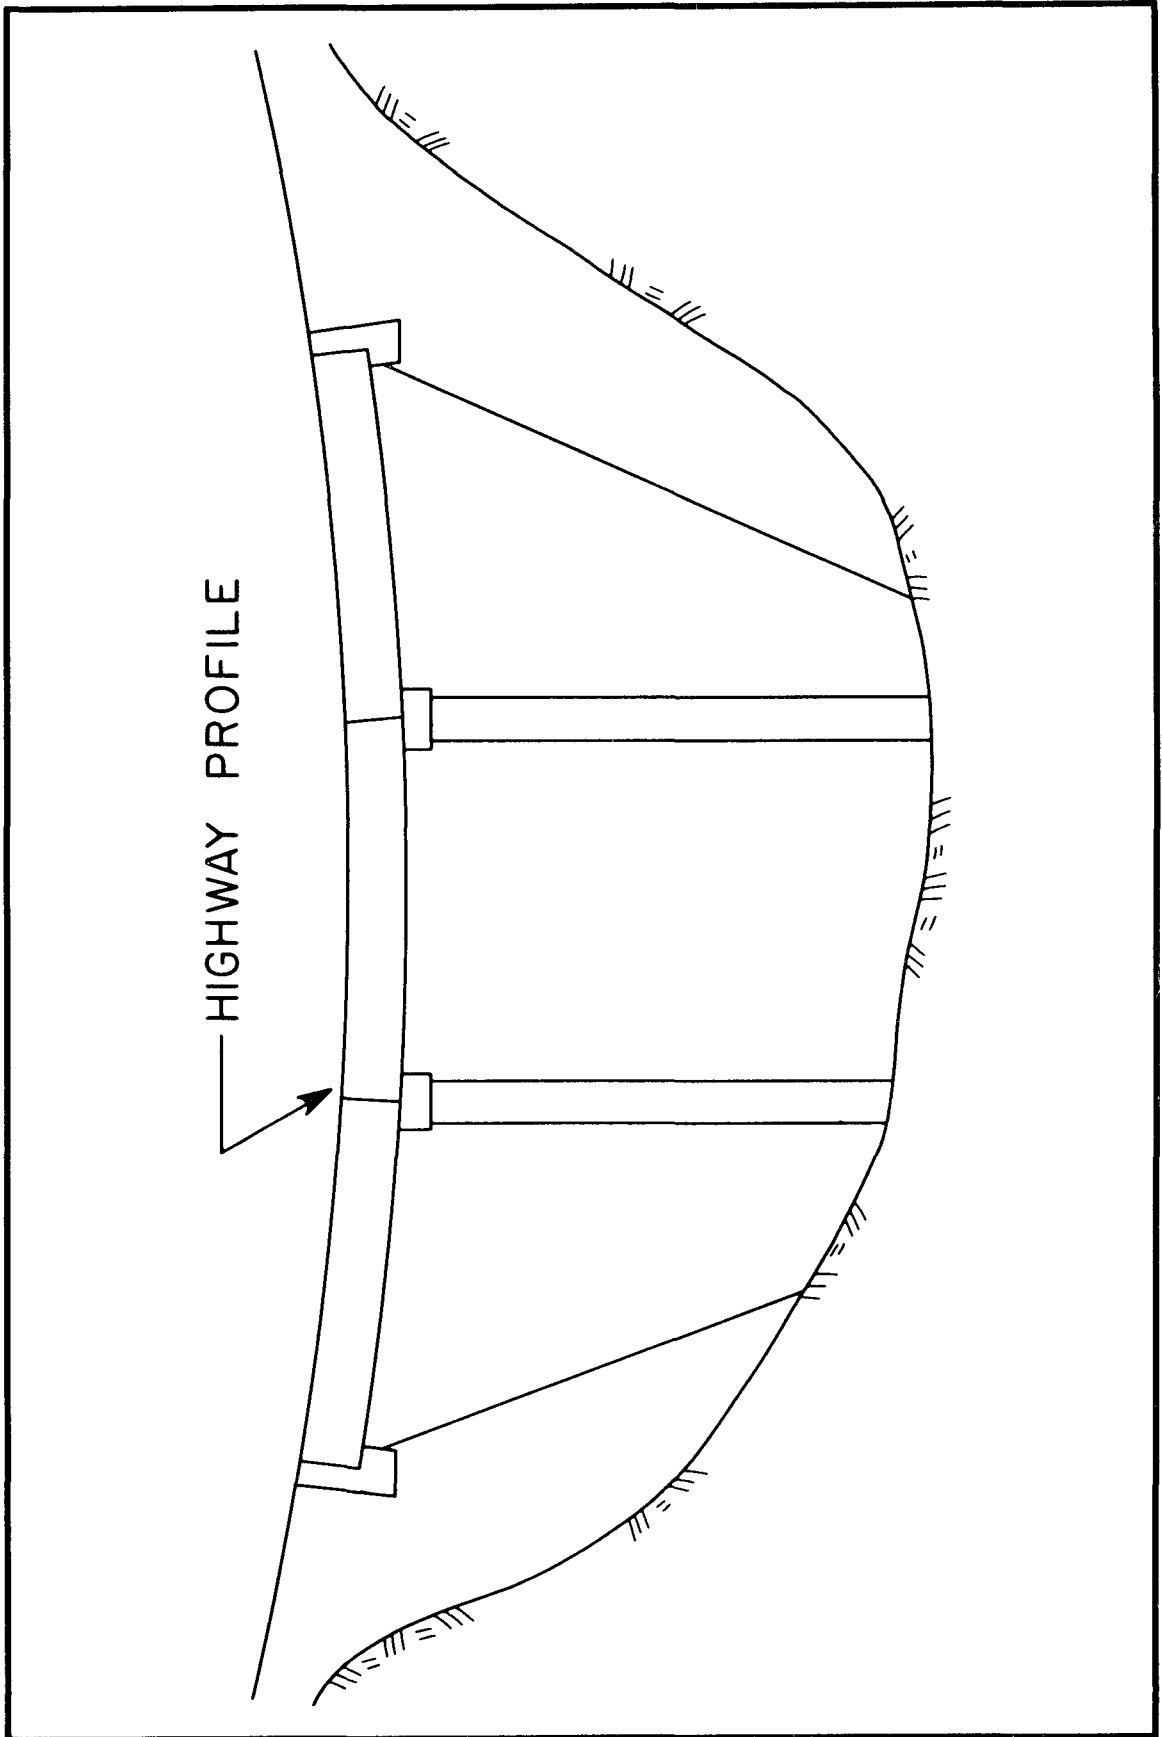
SINGLE OPENING BRIDGE INSTALLATION (THREE SPAN)
